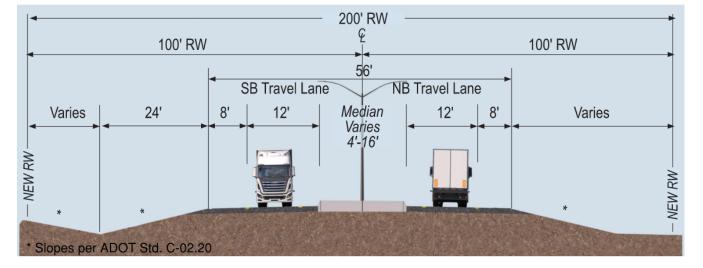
Typical Section - Preferred Alternative (Interim)
